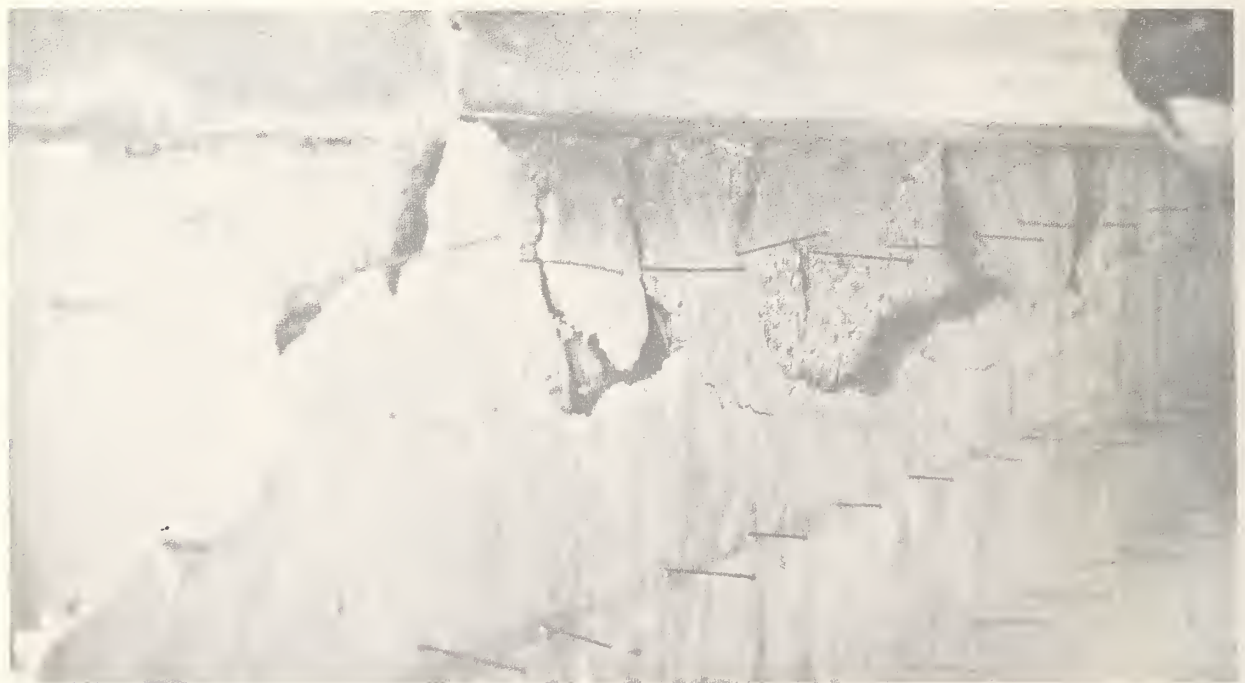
Flexure cracking in diaphragm abutment -
